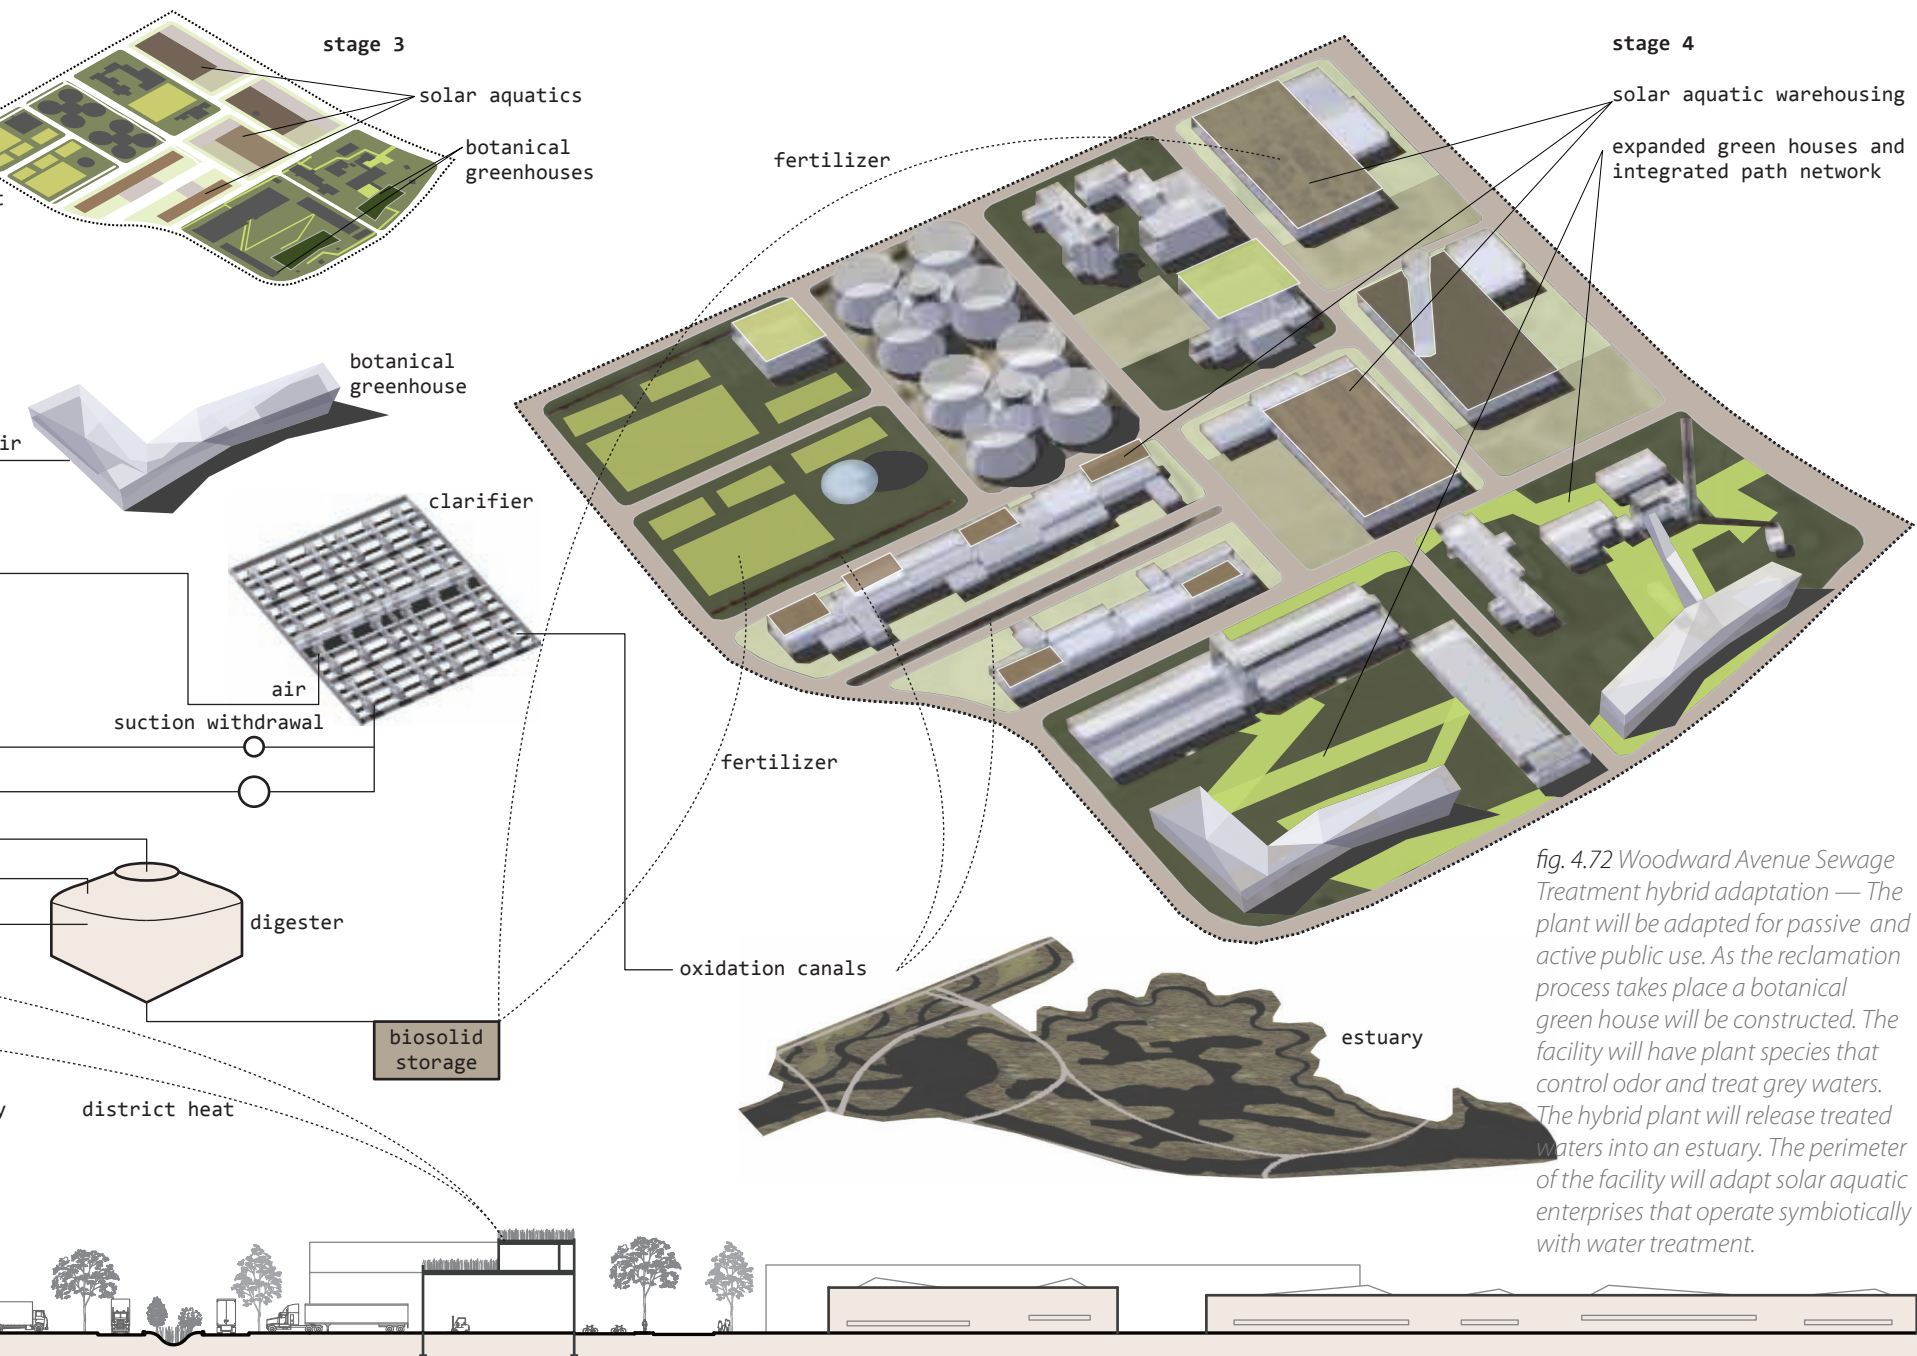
Woodward Avenue Sewage Treatment hybrid adaptation — The plant will be adapted for passive and active public use. As the reclamation process takes place a botanical green house will be constructed. The facility will have plant species that control odor and treat grey waters. The hybrid plant will release treated waters into an estuary. The perimeter of the facility will adapt solar aquatic enterprises that operate symbiotically with water treatment.
